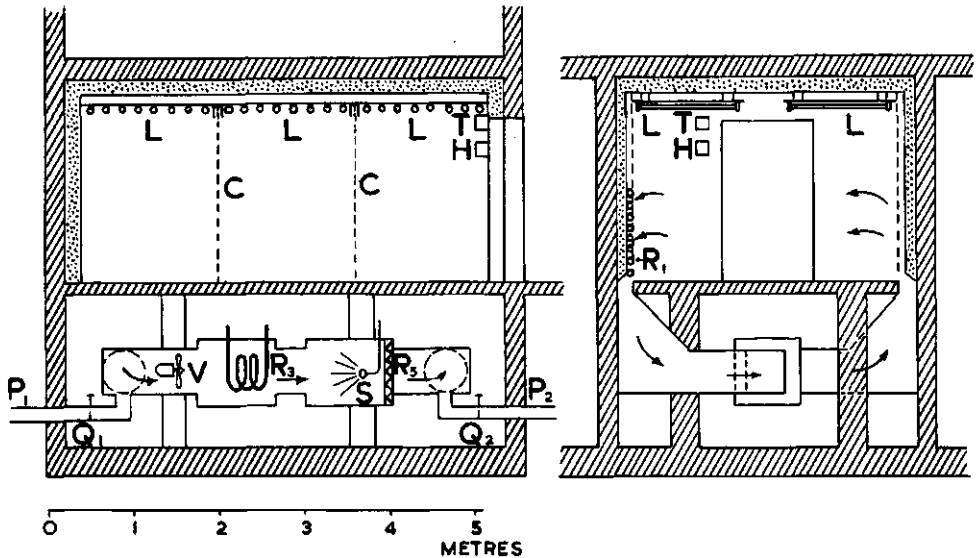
LONGITUDINAL SECTION AND CROSS SECTION OF A WARM ROOM
